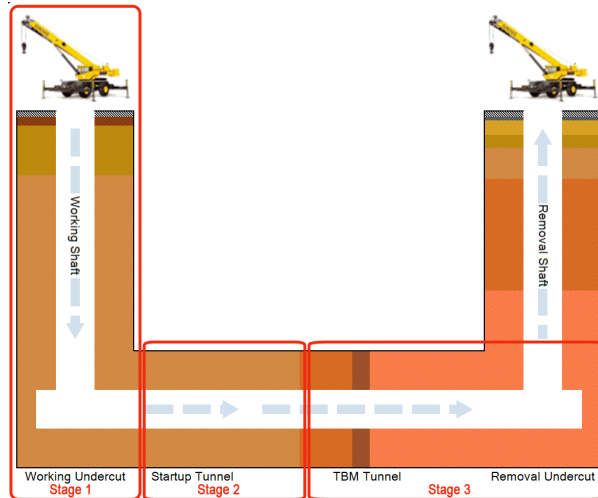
Trenchless TBM tunnel components and initial stages of tunnel excavation
